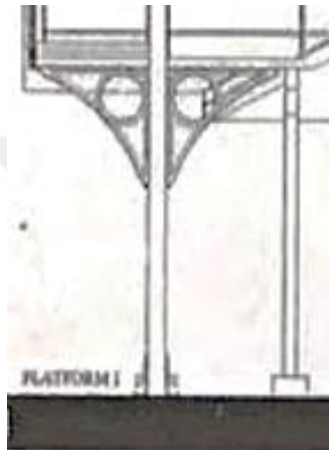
Timber column with steel knee braces at Taiping Station, Perak [67]
